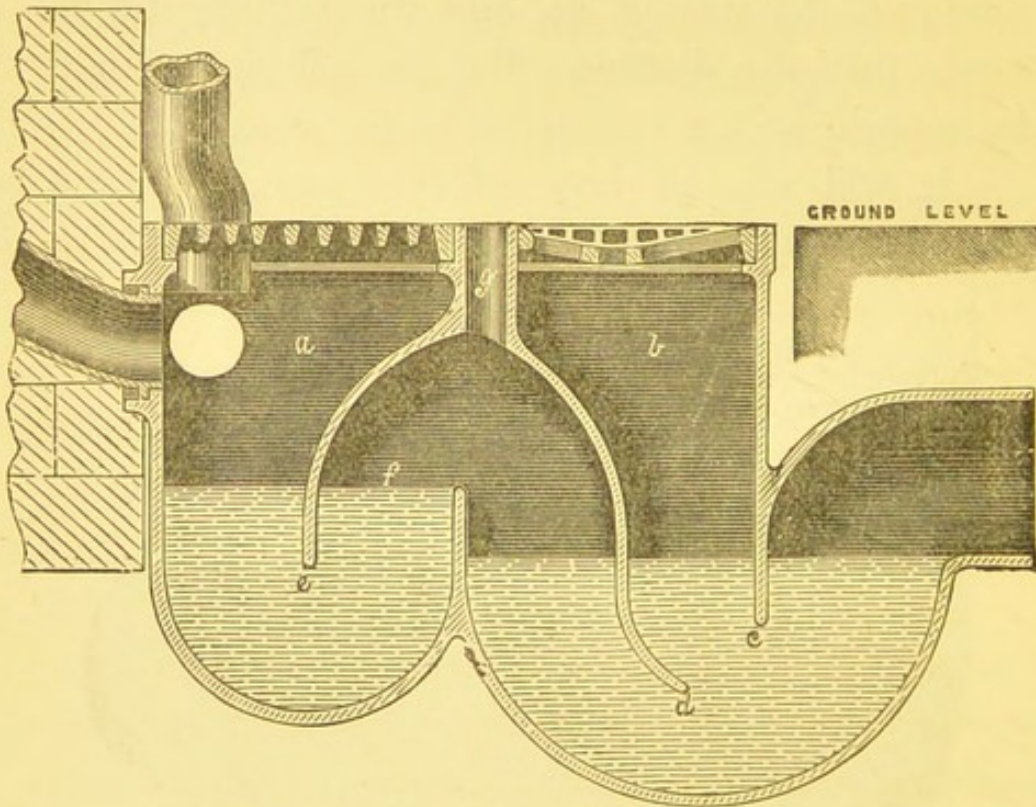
LONGITUDINAL VERTICAL SECTION.
